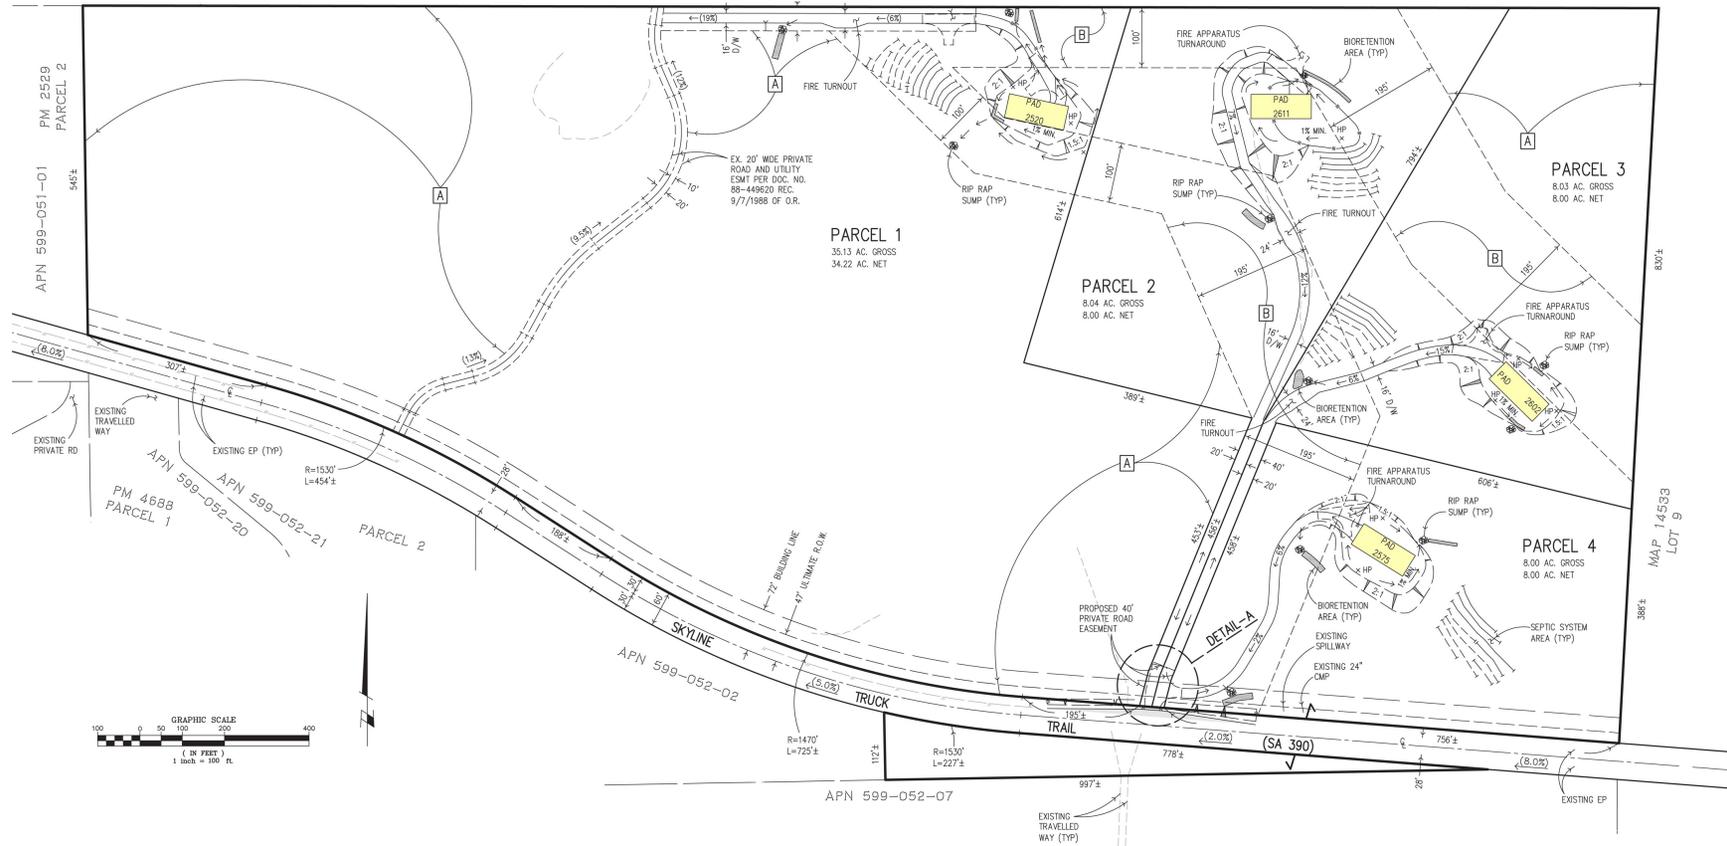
Proposed Site Skyline Truck Trail Residential Development Plan (Crew Engineering 4/11)
